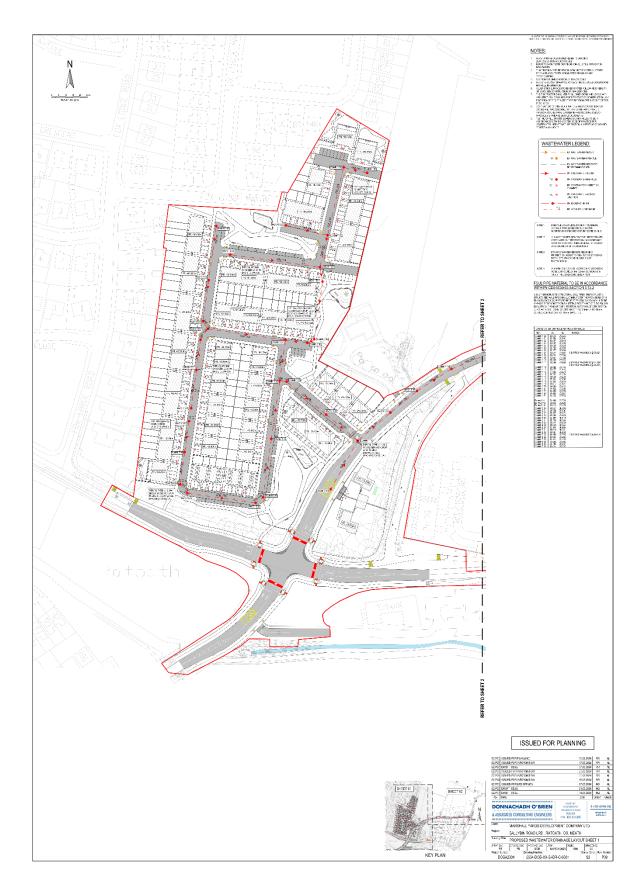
PROPOSED WASTE WATER DRAINAGE FOR THE PROPOSED DEVELOPMENT (DONNACHADH O'BRIEN AND ASSOCIATES, 2024E)).
